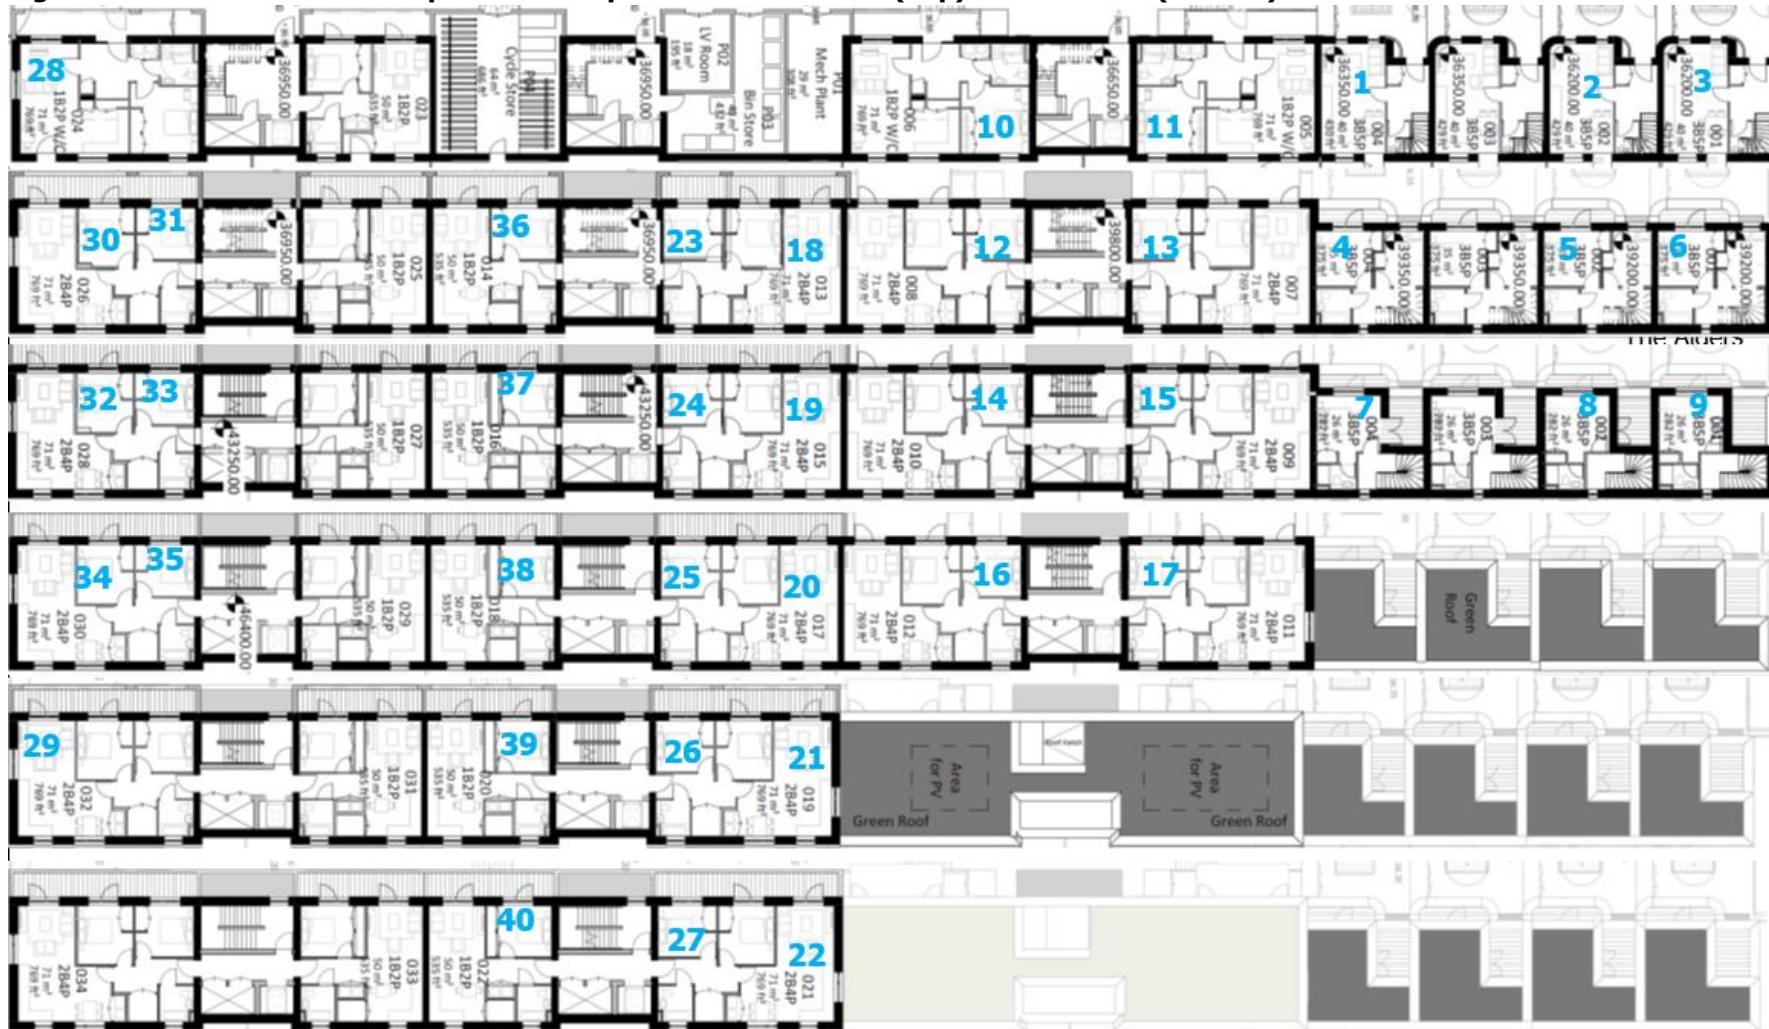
Room Locations of Proposed Development NSL: Ground Floor (Top) to Fifth Floor (Bottom)
